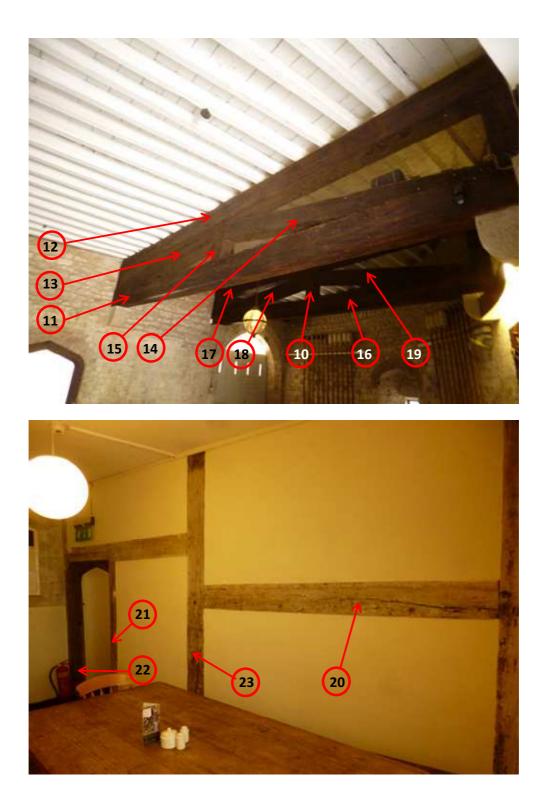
/d: Annotated photographs of the Gatehouse roof (top) and Servant's Hall groundfloor partition wall (bottom) to locate sampled timbers (photographs Robert Howard)
